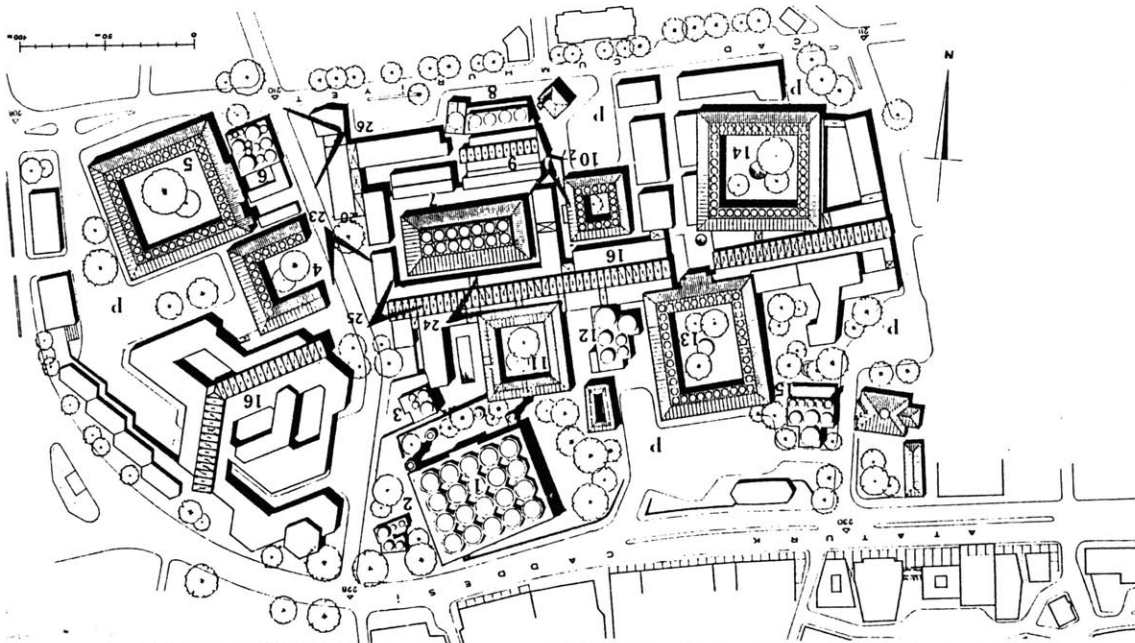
Plan of central commercial area with rebuilding proposal by Picinato
